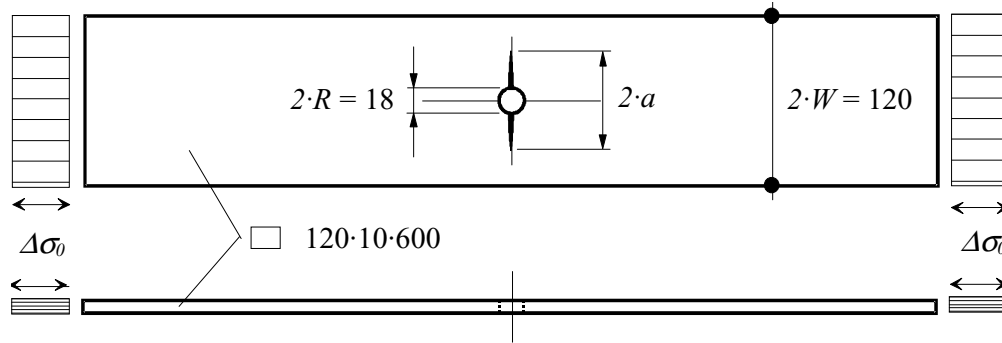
Tested specimen geometry (dimensions in [mm]).
